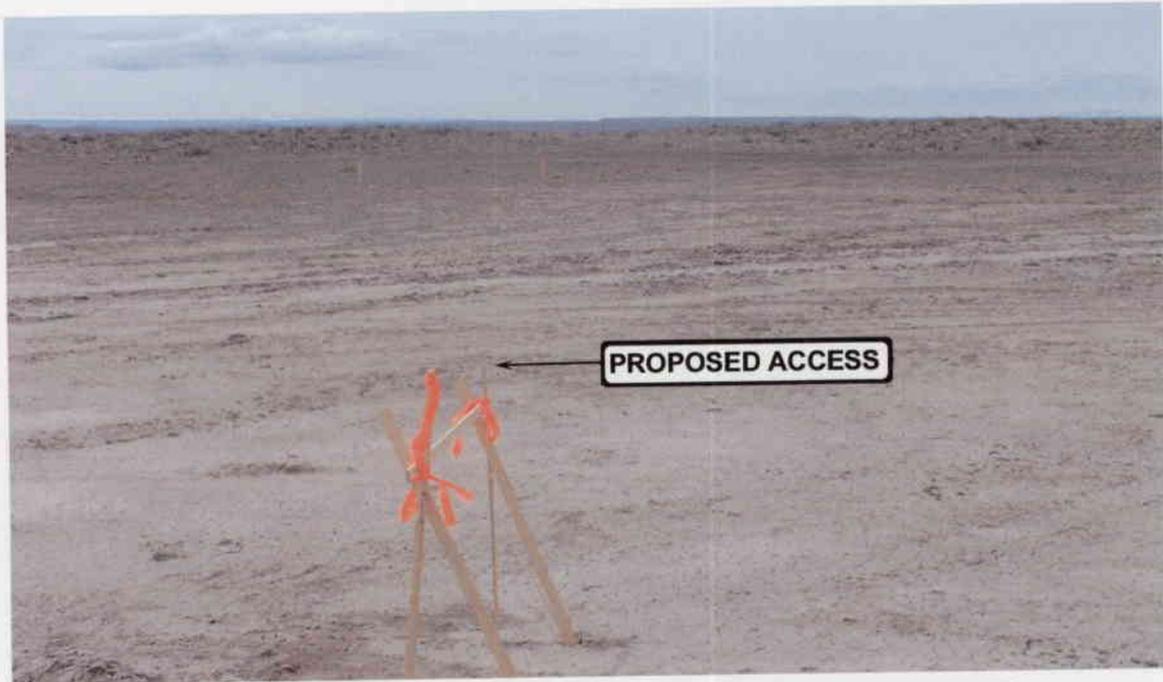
PHOTO: VIEW FOM BEGINNING OF PROPOSED ACCESS
